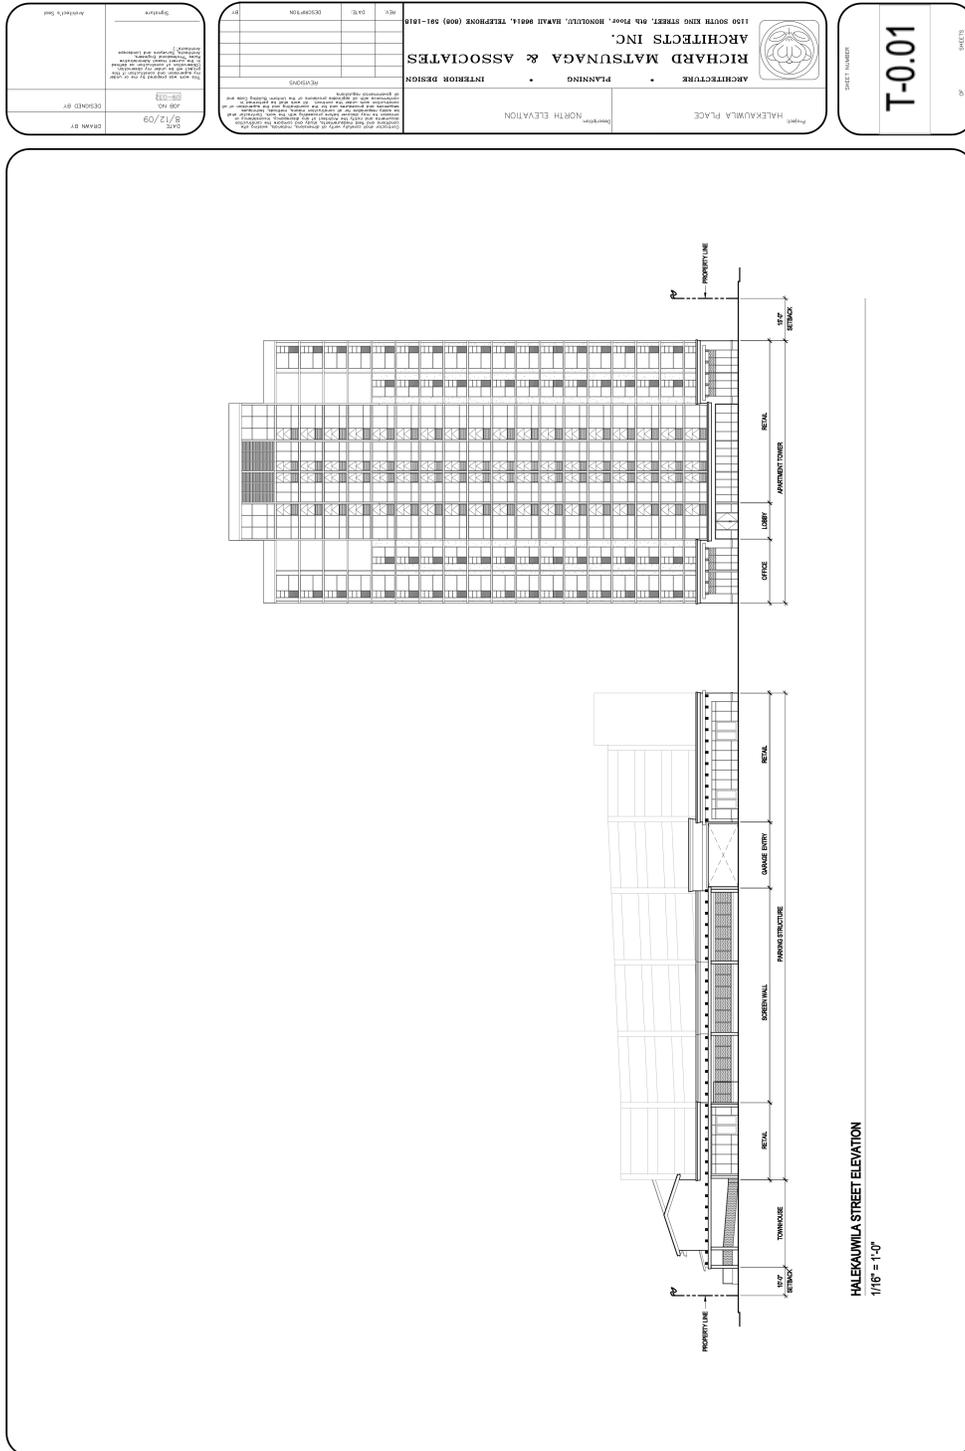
HALEKAUWILA STREET ELEVATION (EAST)
